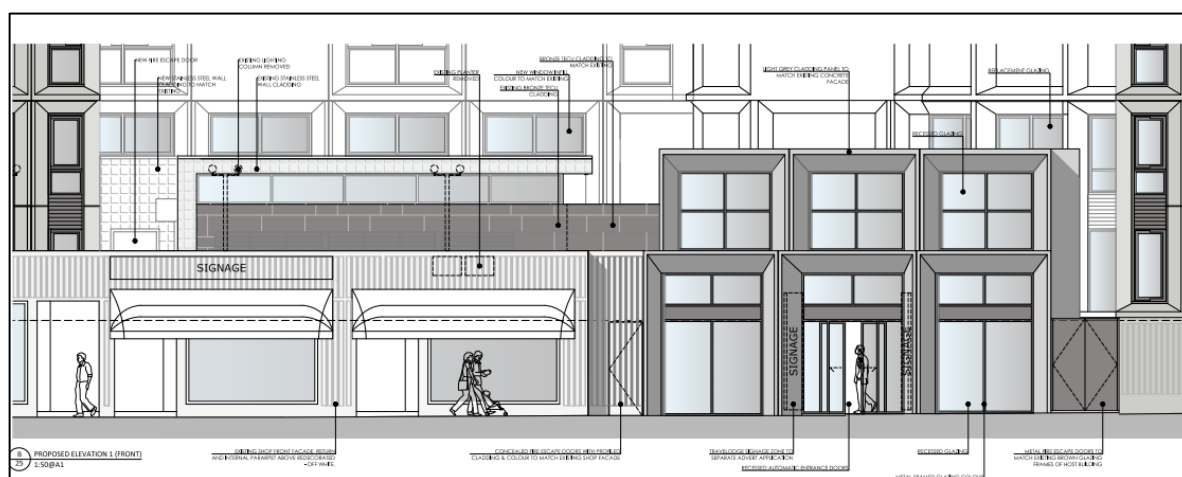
Proposed New Entrance (drawing J9348 – 25H)
